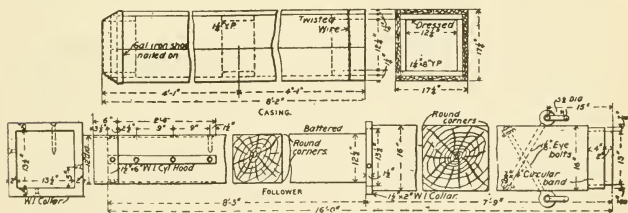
FORM AND BOX FOLLOWER FOR COMBINATION WOOD AND CONCRETE PILE.
